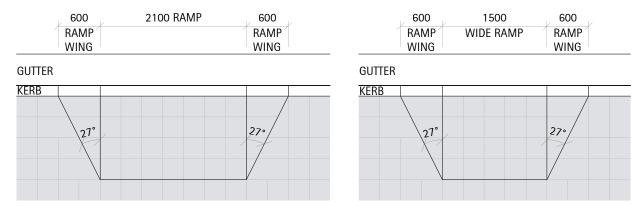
Ramp Wings when Ramp Aligned to Face of Kerb
